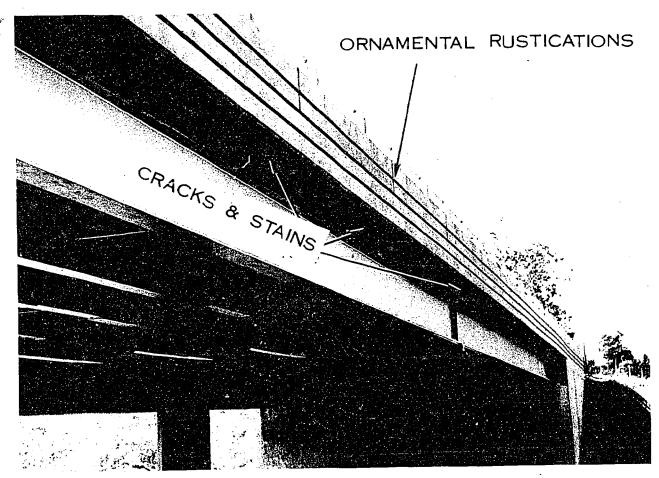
Cracks in sidewalk. Note crack going through slab and note efflorescence stains.
